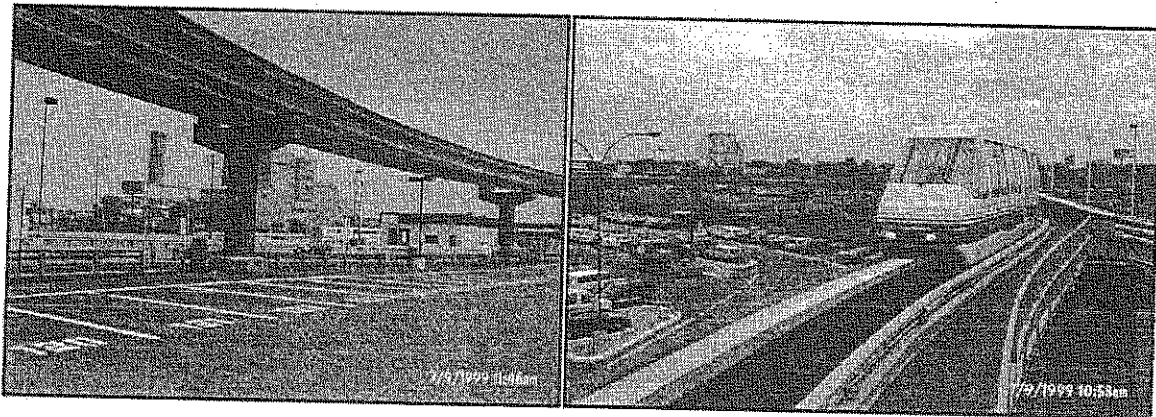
Photographs Showing Typical Elevated Monorail Structure and Monorail Passenger Vehicle
